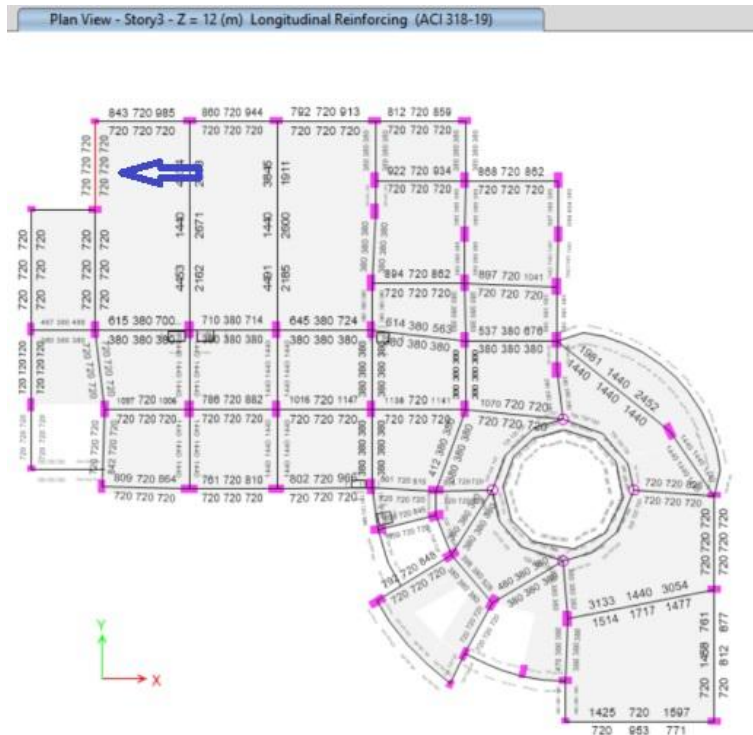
36 Beams that light up red in ETABS due to exceeds maximum reinforcement.
